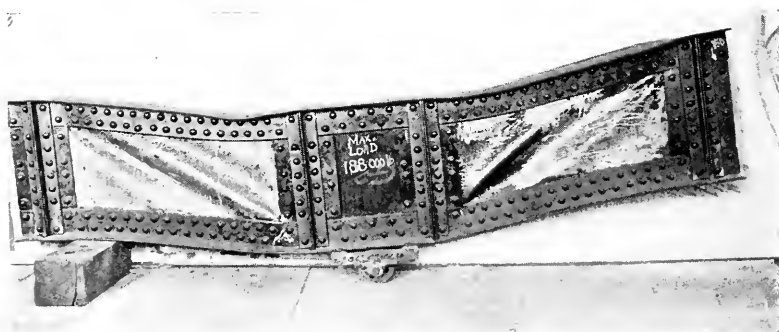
GIRDER 3 AFTER FAILURE
